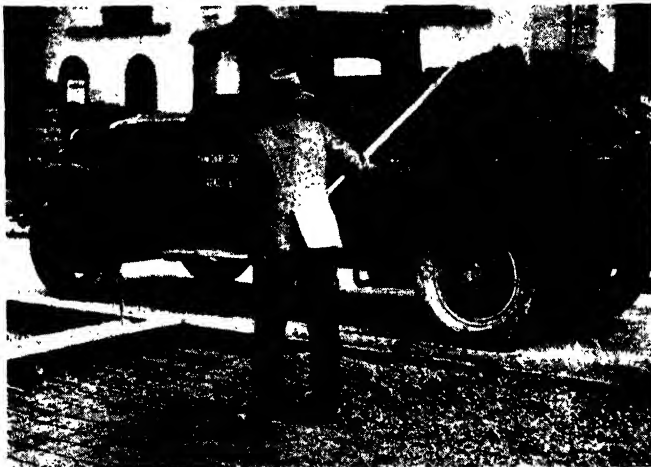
SIDE-TIPPING LORRY ABOUT TO DISCHARGE CONCRETE.
